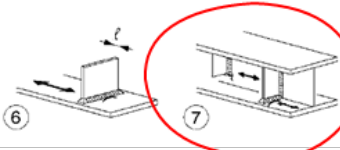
Selected Detail 1 - Welded built-up sections - Detail Category 100 (Extract from Table 8.2 – EN 1993-1-9).
